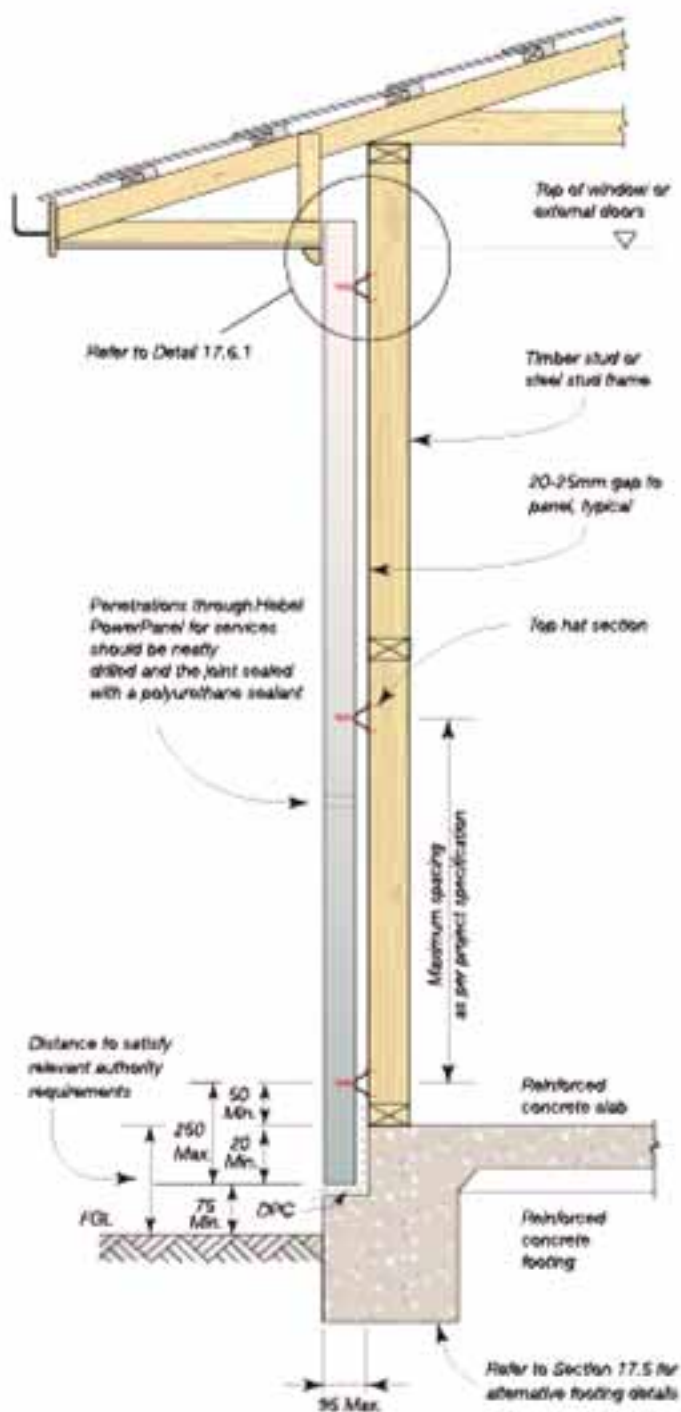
Single Storey Construction - Gable End Elevation
